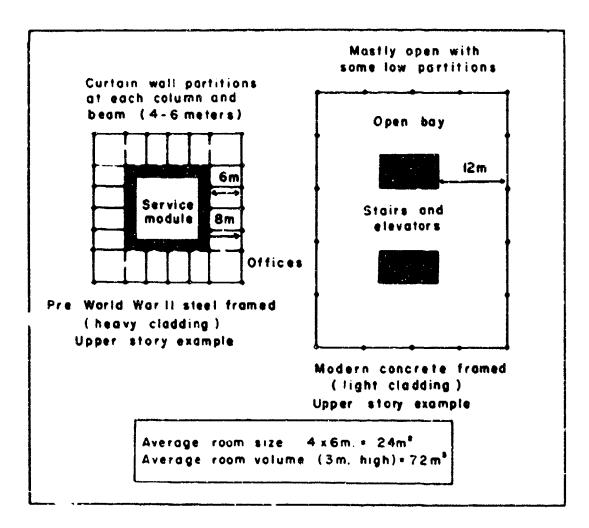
Architectural Factors Affecting Size and Configuration of Building Interiors
